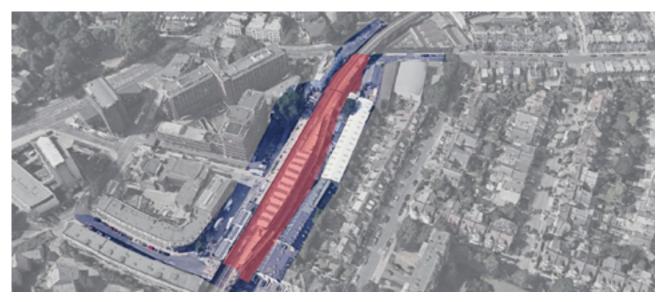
Location of arches 55-66 between Ranelagh Gardens and Hurligham Road. Arches including 419 New King's Road and Hurlingham Road
